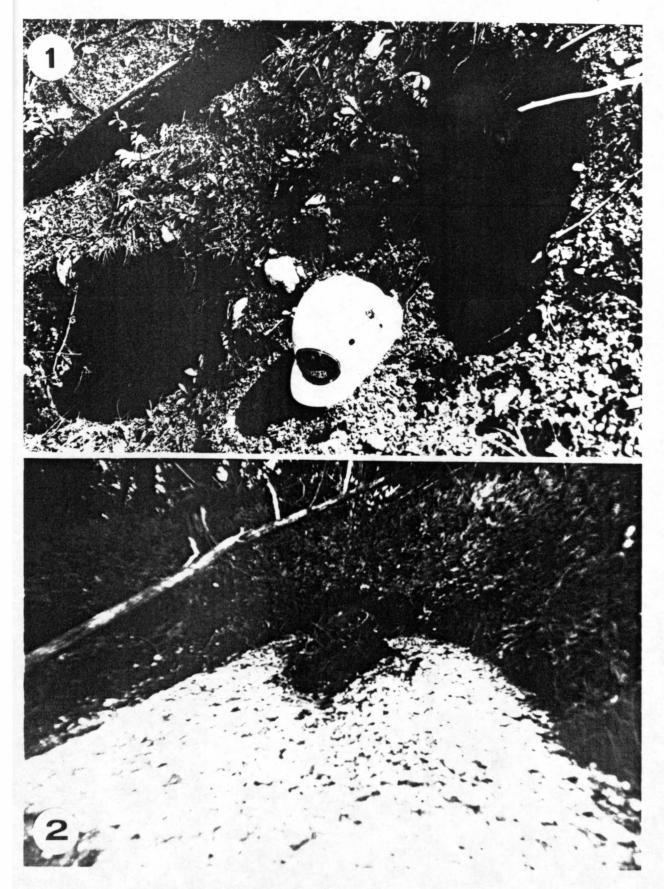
Photographs illustrating piping failures in the east slope of Stoughton Pond, an impoundment on the North Branch Black River. (1) Collapse pits over pipes--hardhat gives scale. (2) Outflow delta deposits from mouth of a pipe at pond level.
